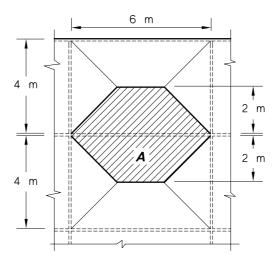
WALLS BOUNDED BY LOAD-BEARING CROSS-WALLS (Walls supporting two-way slabs)
